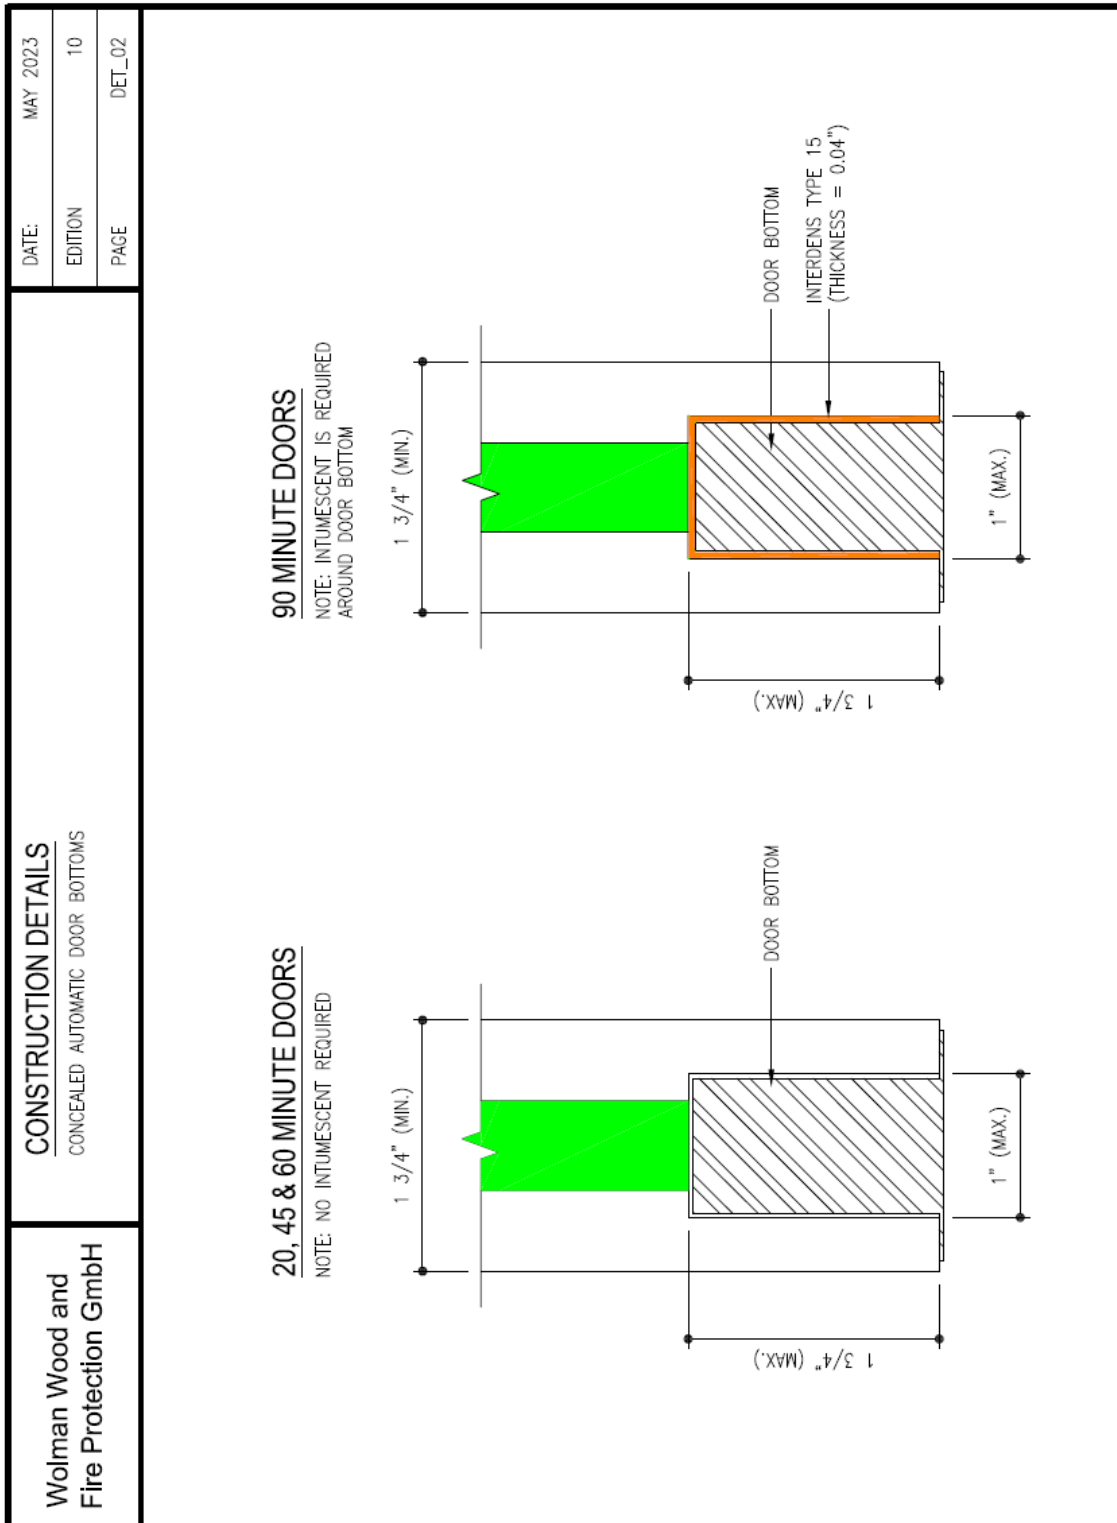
20-90 minute rated concealed door bottom detail for listed door assembly.
